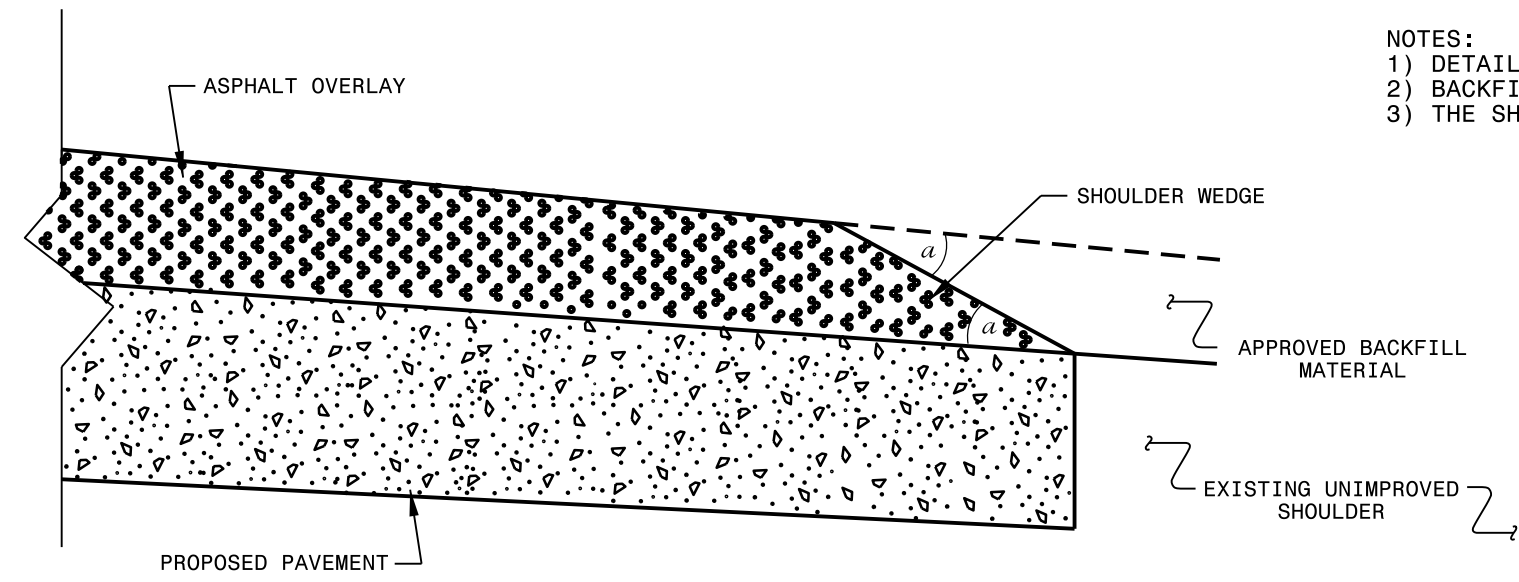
### DETAIL TO TIE INTO EXIST PAVEMENT
